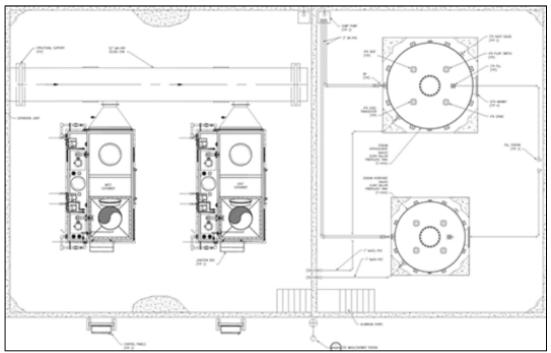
FoP Odor Control Facility Conceptual Layout
